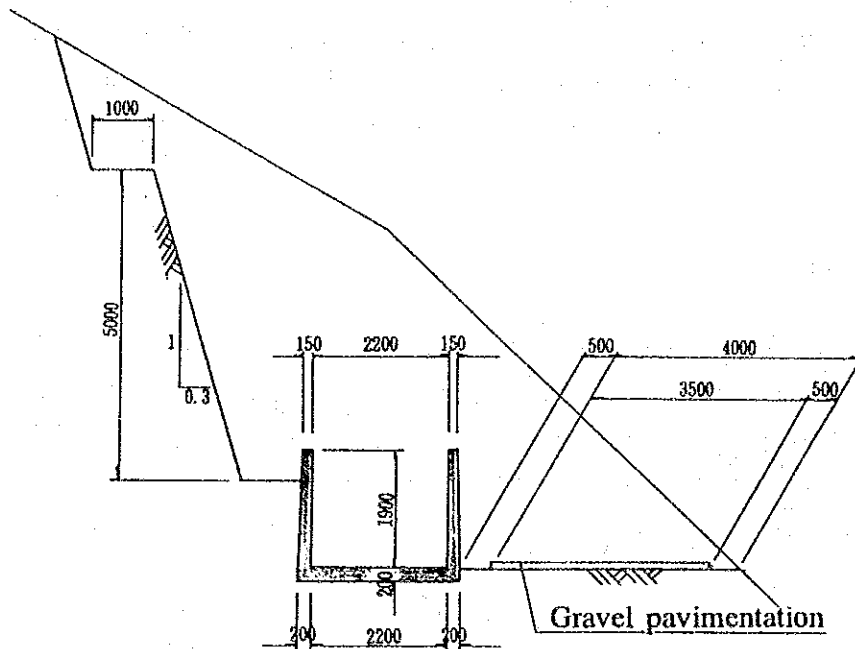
Standard Section of Open Canal (Head Race)
